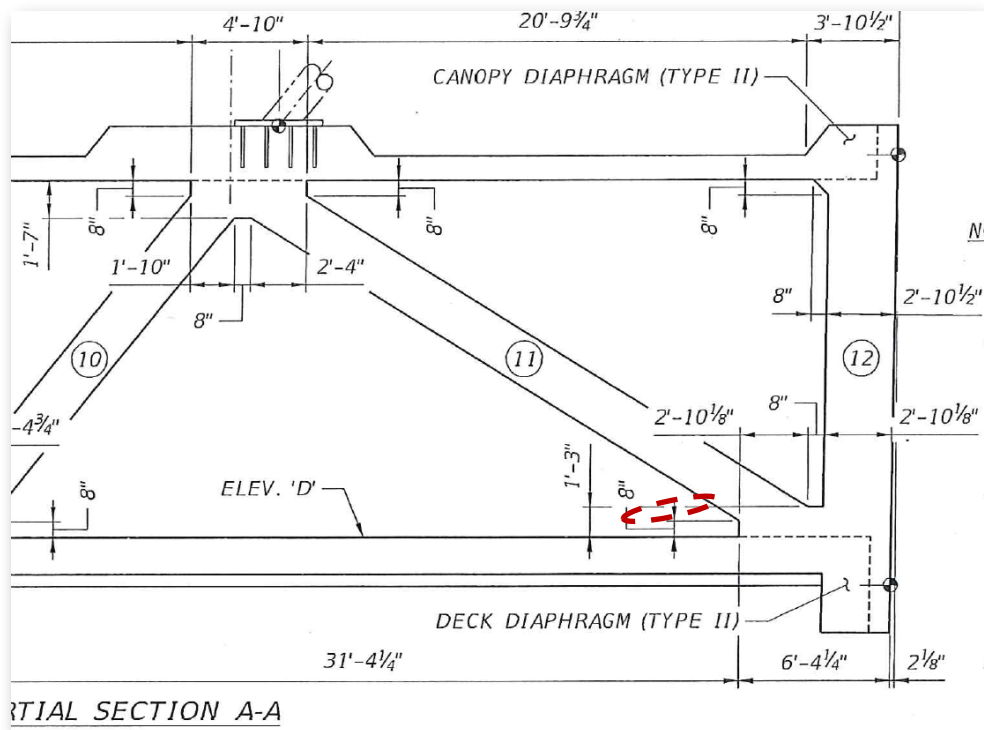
Shear capacity check at discontinuity at base of Member 11, as outlined in red.²⁵⁴
